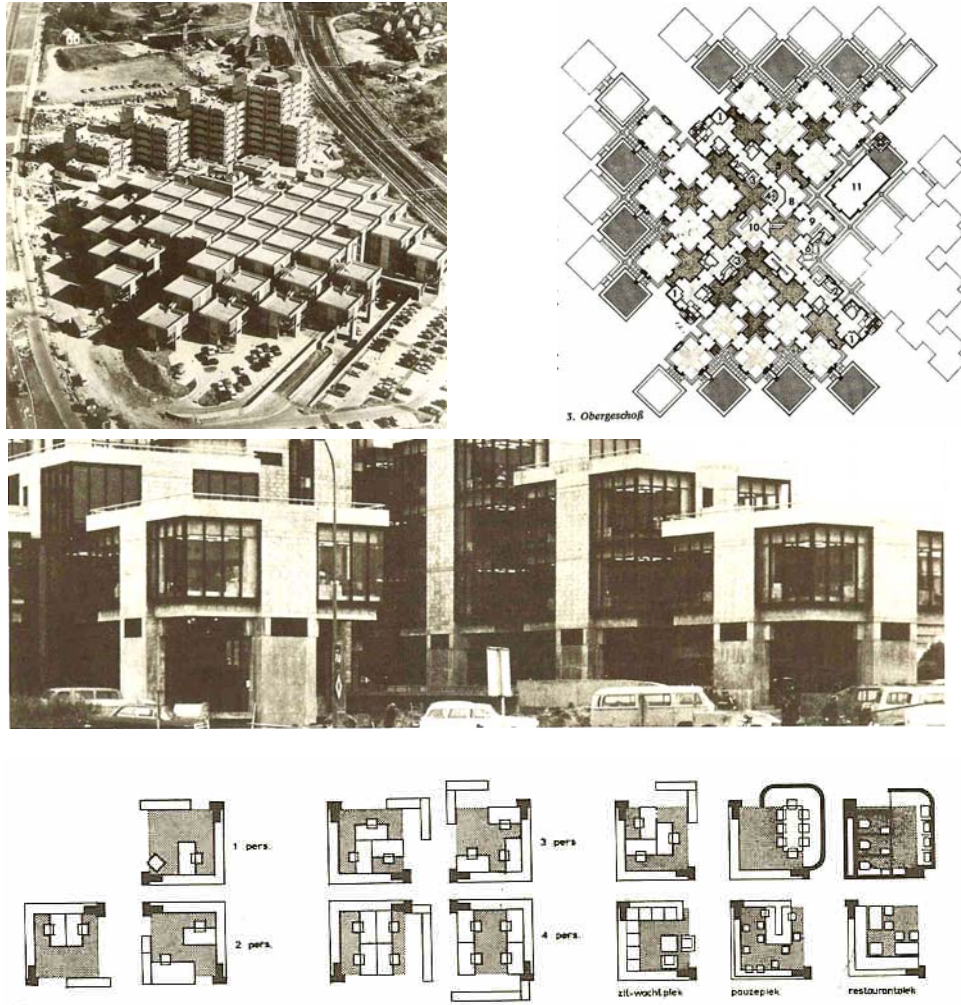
Central Beheer office by Herman Hertzberge, Eternal views, Typical floor plan and a detailed workplace plan.
